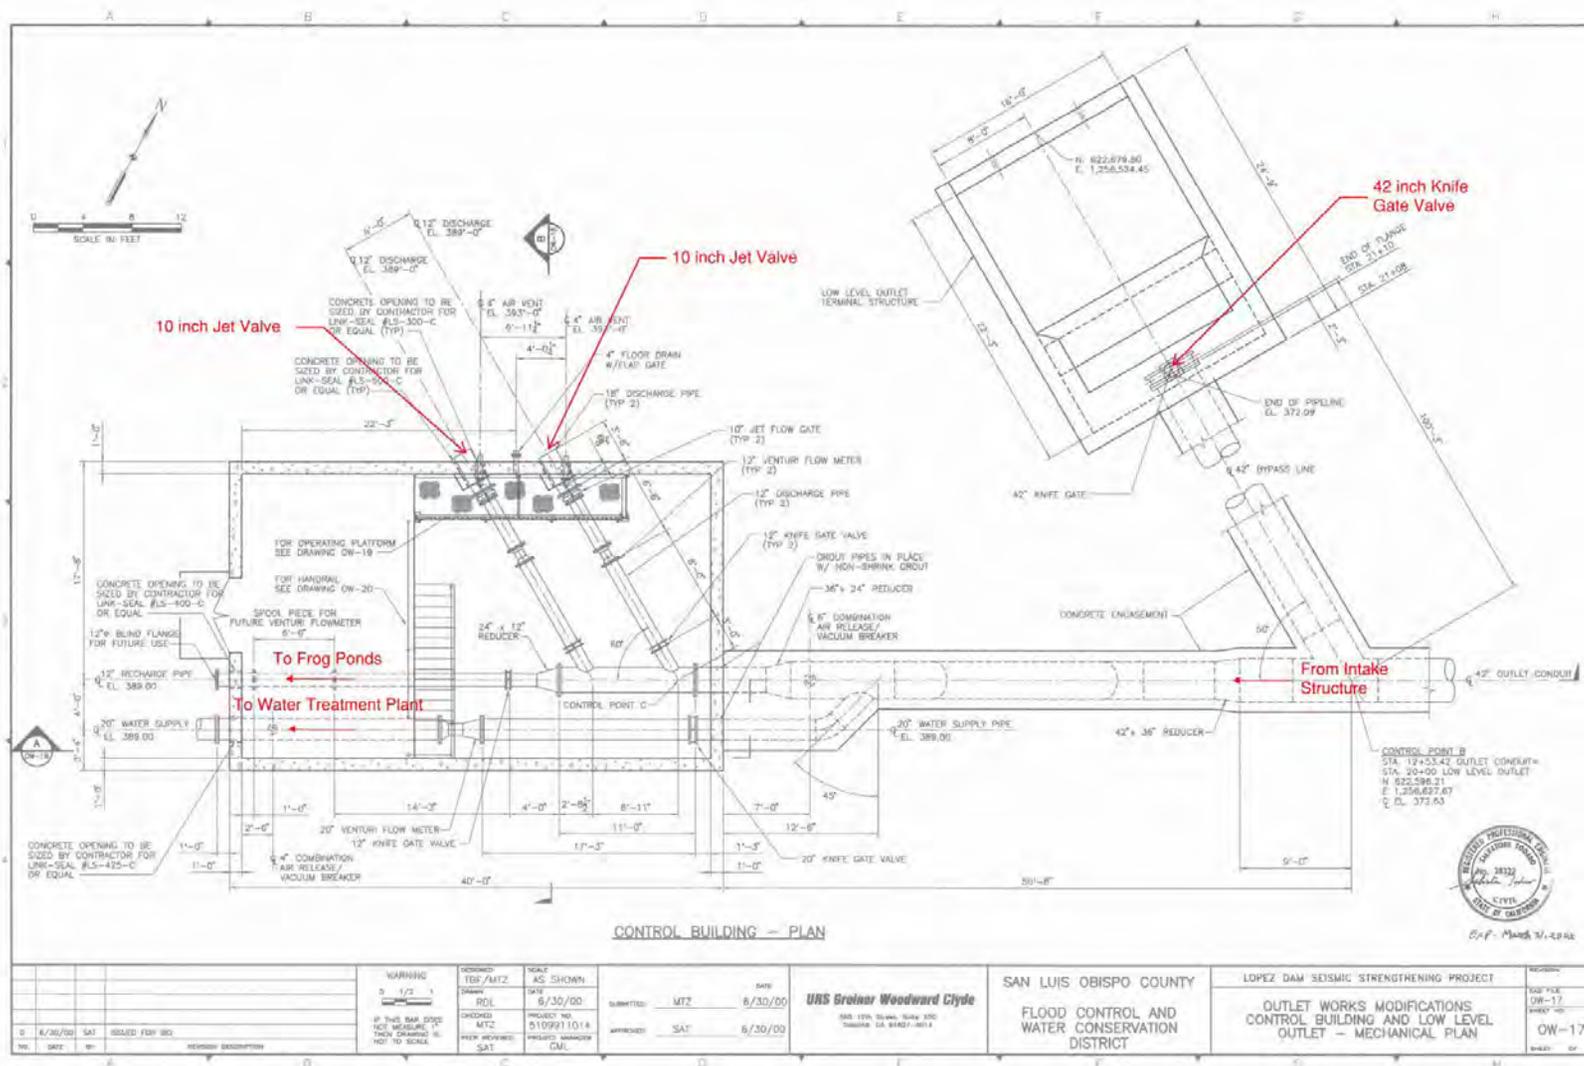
Outlet Control Building and Low-Level Outlet.
